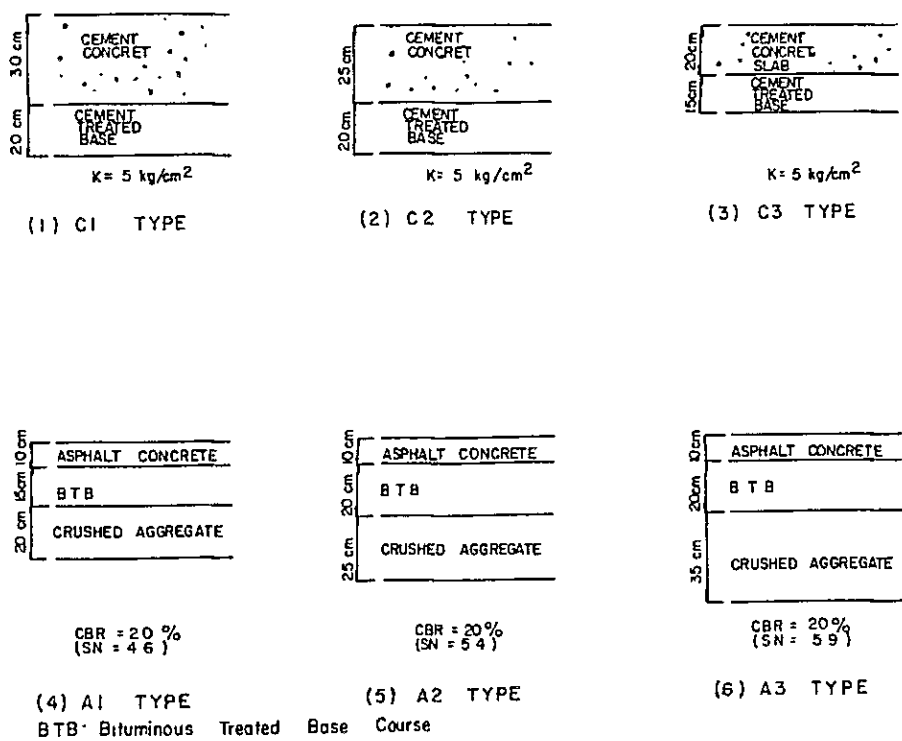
PROPOSED PAVEMENT STRUCTURES
